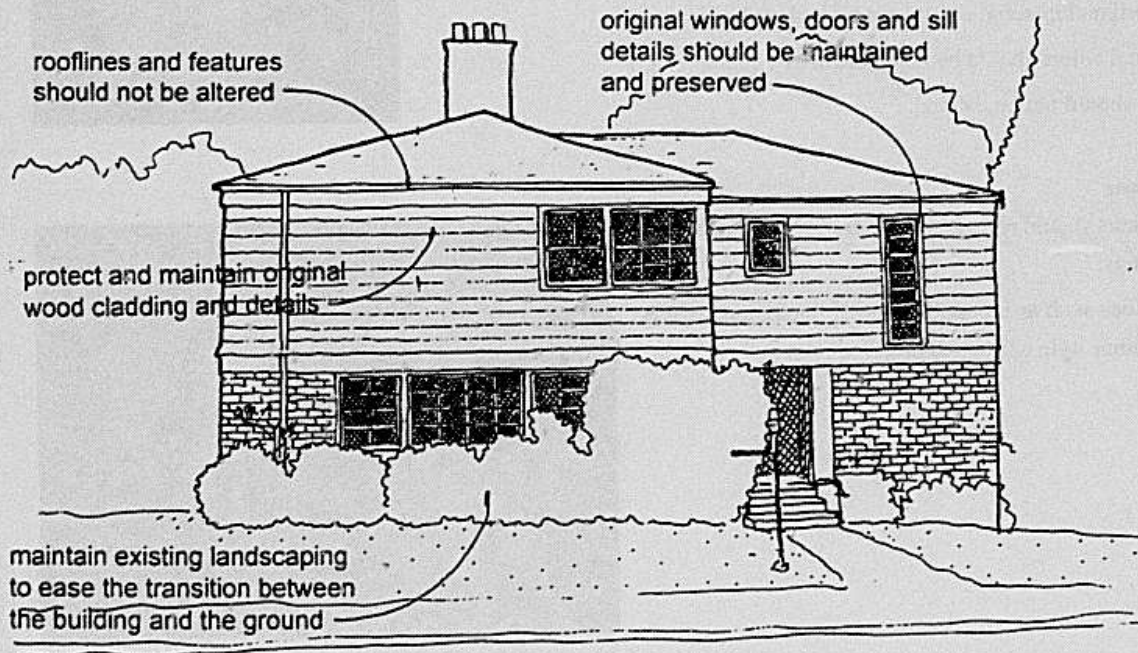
Buildings 330, 331, 332 recommendations
